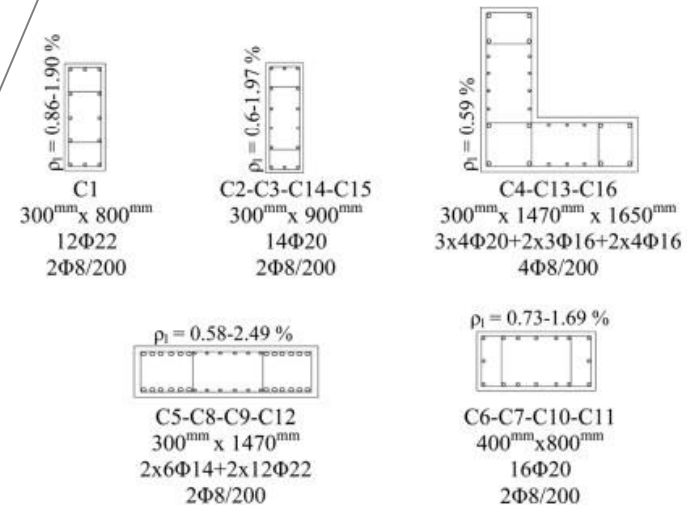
Cross-sectional dimensions, longitudinal and transverse reinforcement of typical column sections at ground level (adapted from Çağınan 2001).
